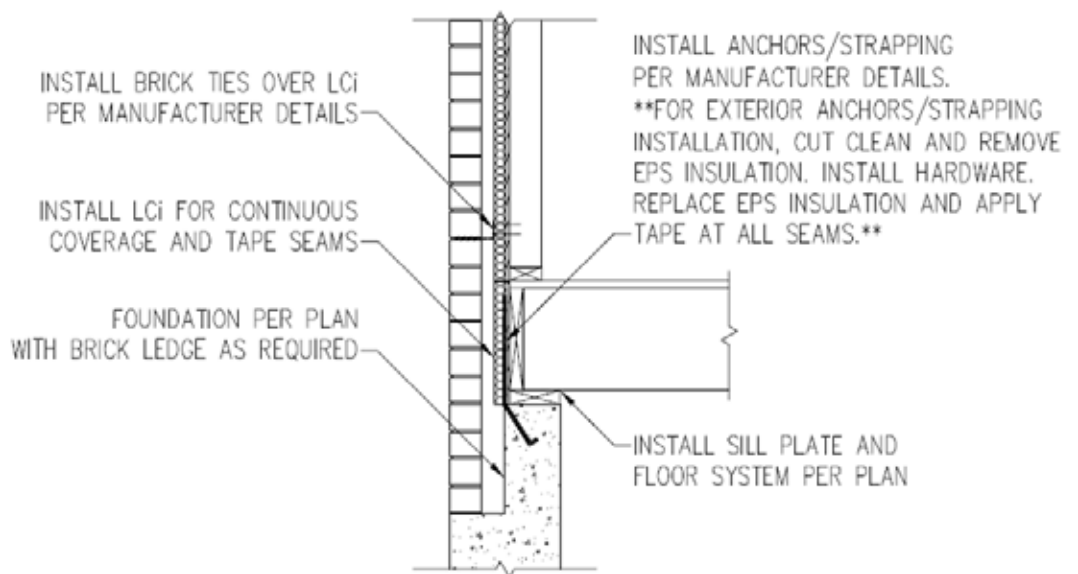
TYPICAL WALL SECTION AT FLOOR DECK WITH BRICK
